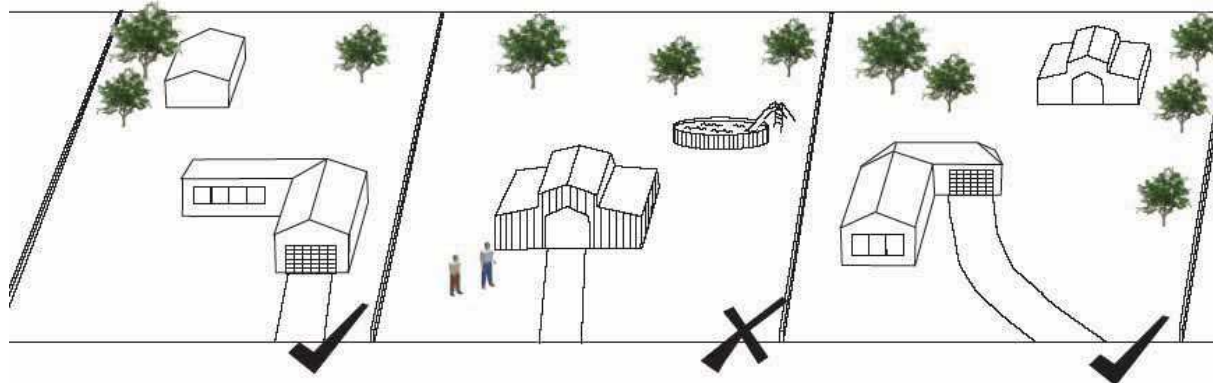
Outbuildings within residential areas should be used in association with a dwelling. Outbuildings are not considered habitable.
